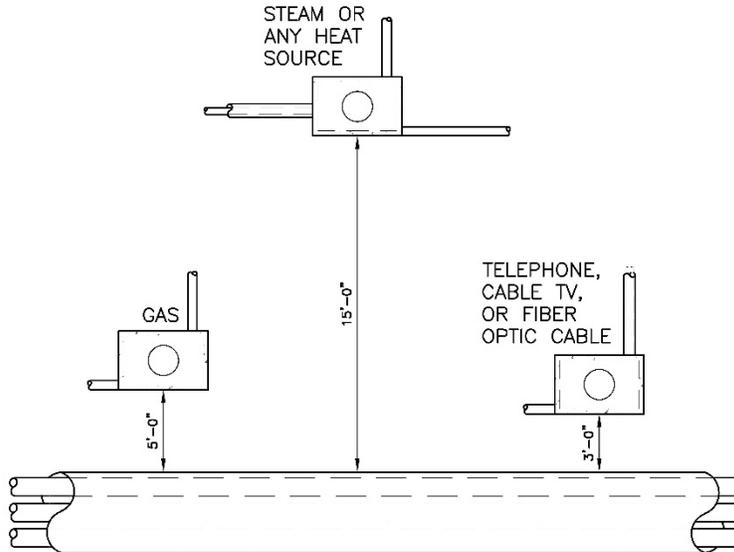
Horizontal Clearances for Conduits and Duct Banks up to 26 kV, Water Structures, Plan View
